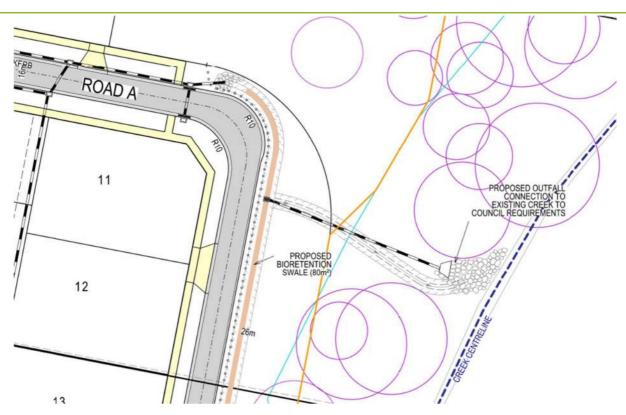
Proposed Outfall Arrangement to Existing Creek
